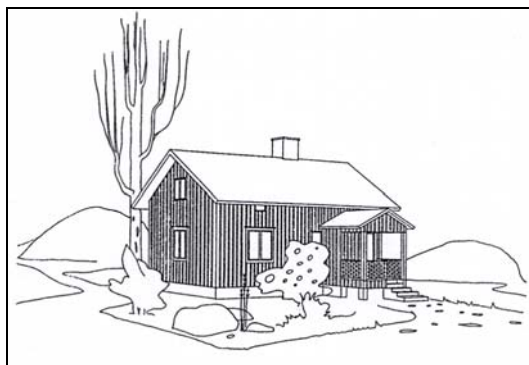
A house from the reconstruction period is one-and-a-half storey and its roof is steep. The house always has a cellar.
